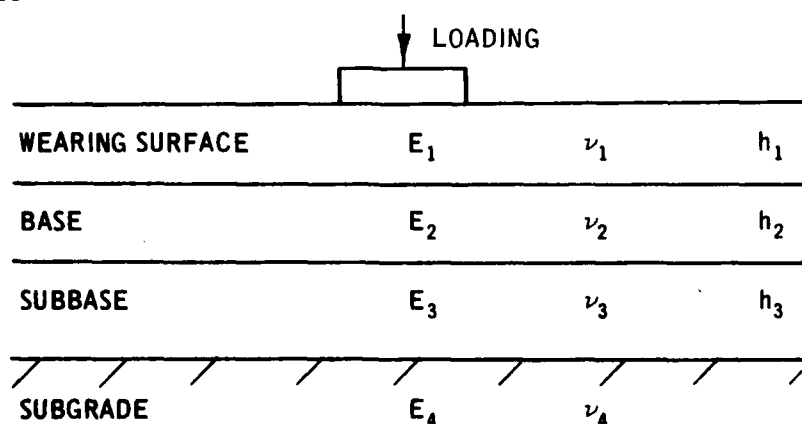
Typical pavement structure with loading according to the layered elastic theory
